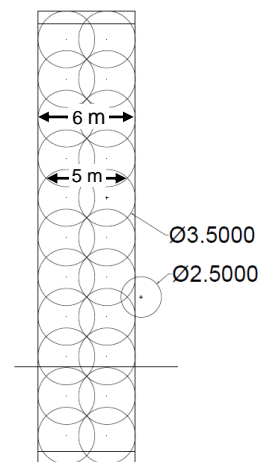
Design plan of the jet grouted preceding beam (Block F)
